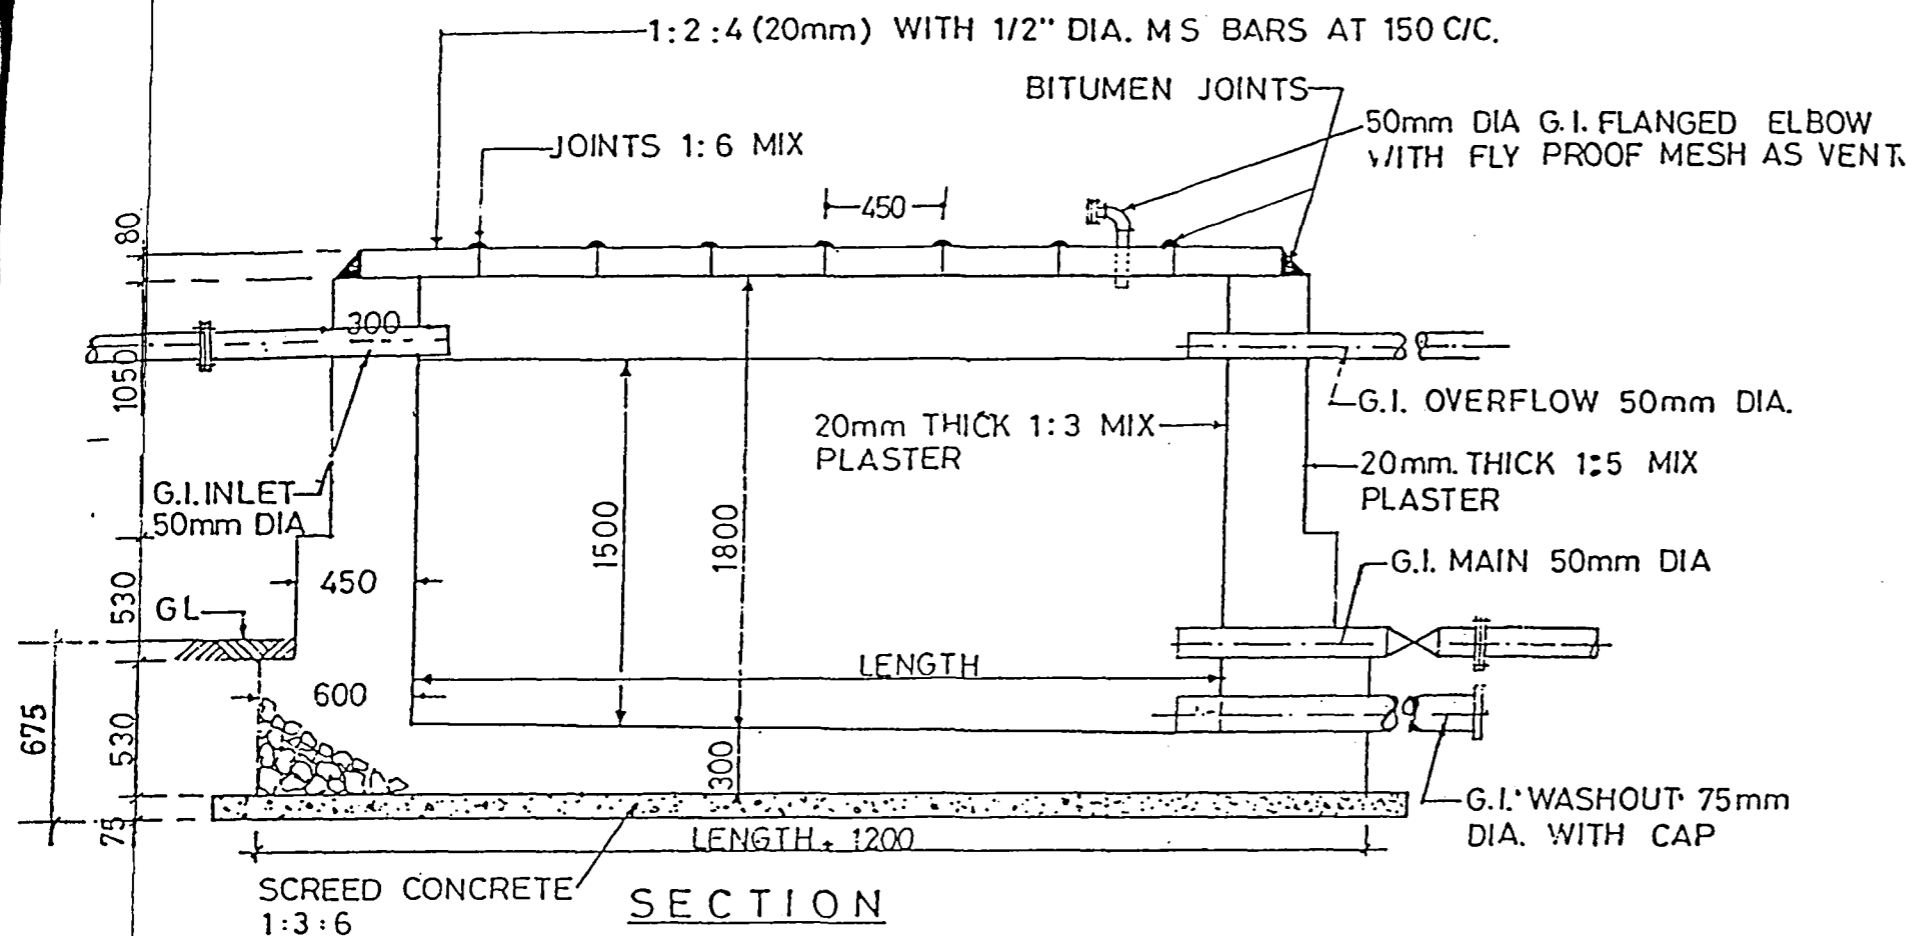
DETAIL - FOUNDATION & DRY RUBBLE PITCHING
